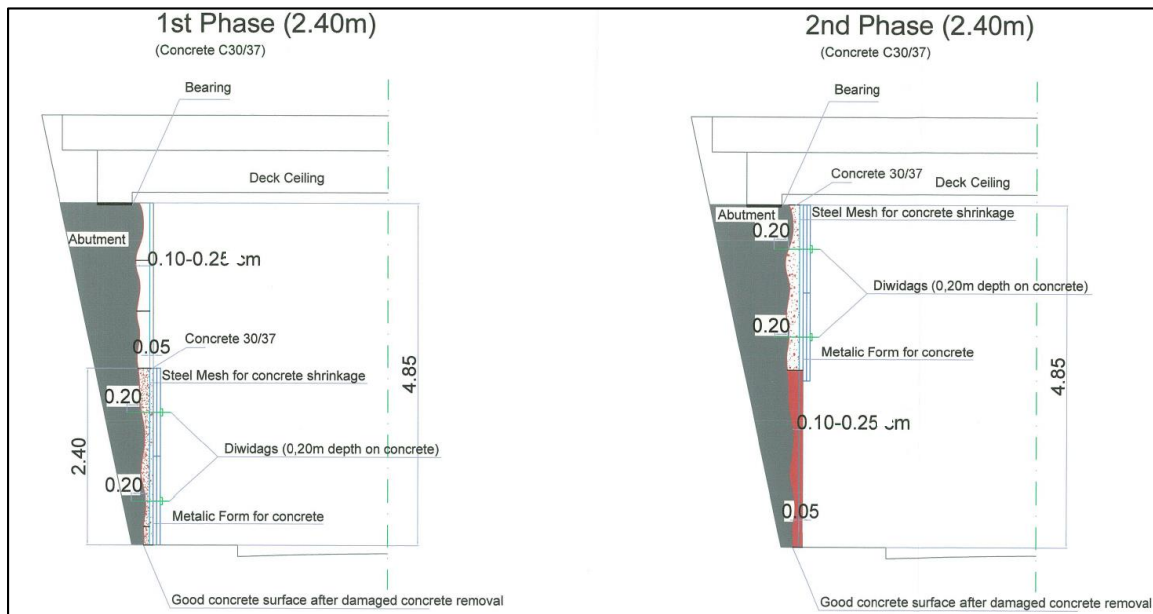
Plan of two stage repair of damaged abutments; adding of new steel mash for shrinkage control and new concrete layer
